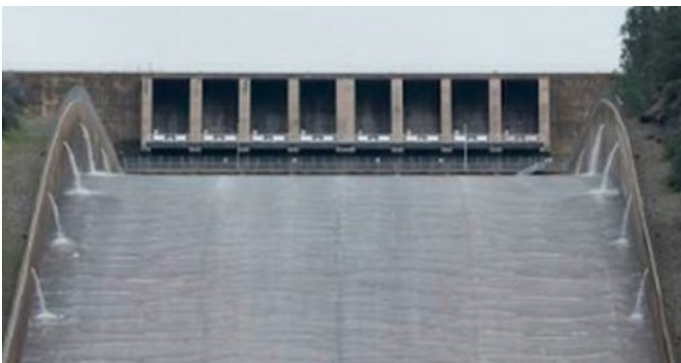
Damaged joint sealant (Source: Paul G Schweiger)
